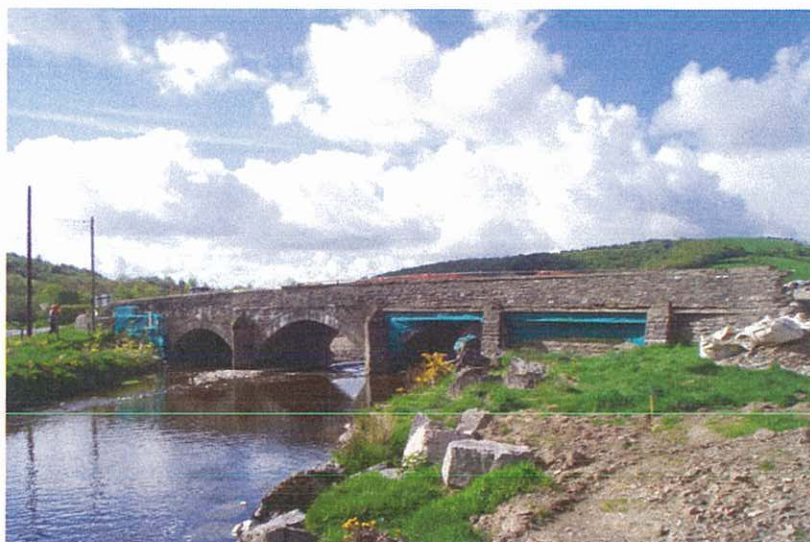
Central arch on the northeast-facing elevation of the 1822 bridge.
